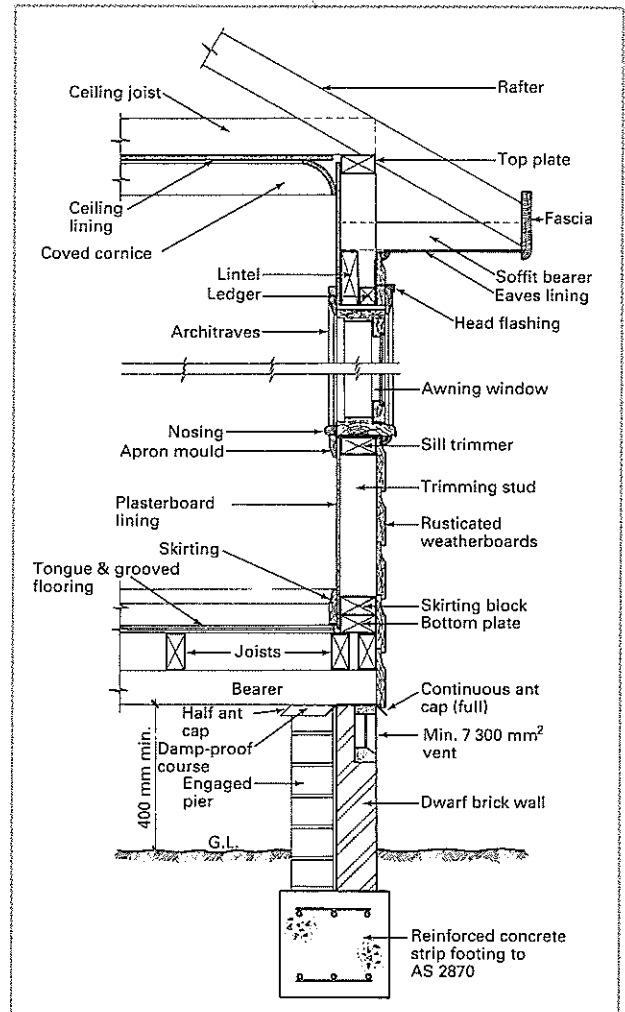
Vertical section through an external timber frame wall and timber awning window
